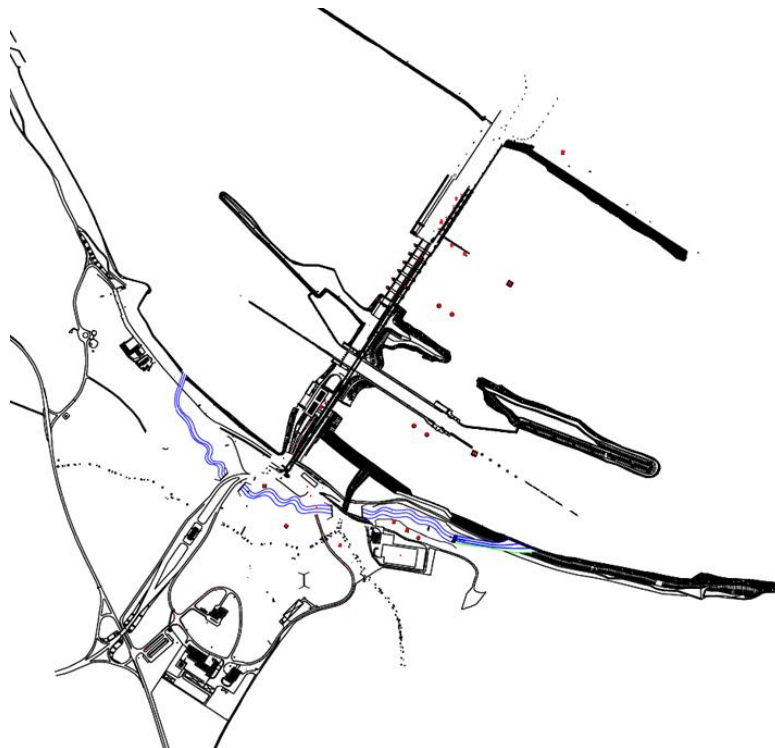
Fish Passage Alignment (Site Plan) (drawing by author in AutoCAD).
